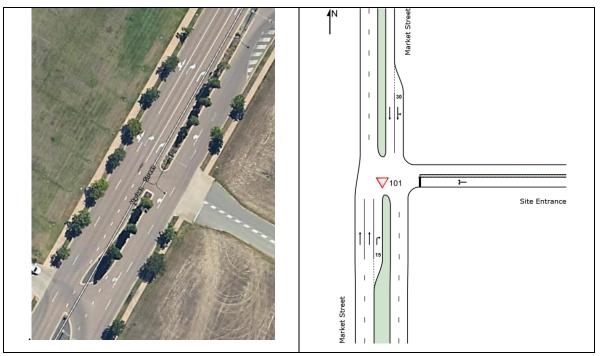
Market Street / Northern Site Access Intersection Layout
